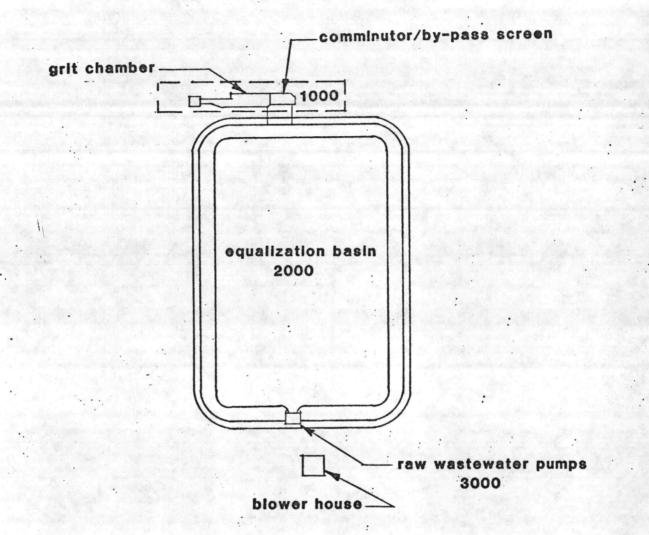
shows a plant schematic divided up according up the major systems in the plant. A detailed list of equipment index is given in Appendix.
